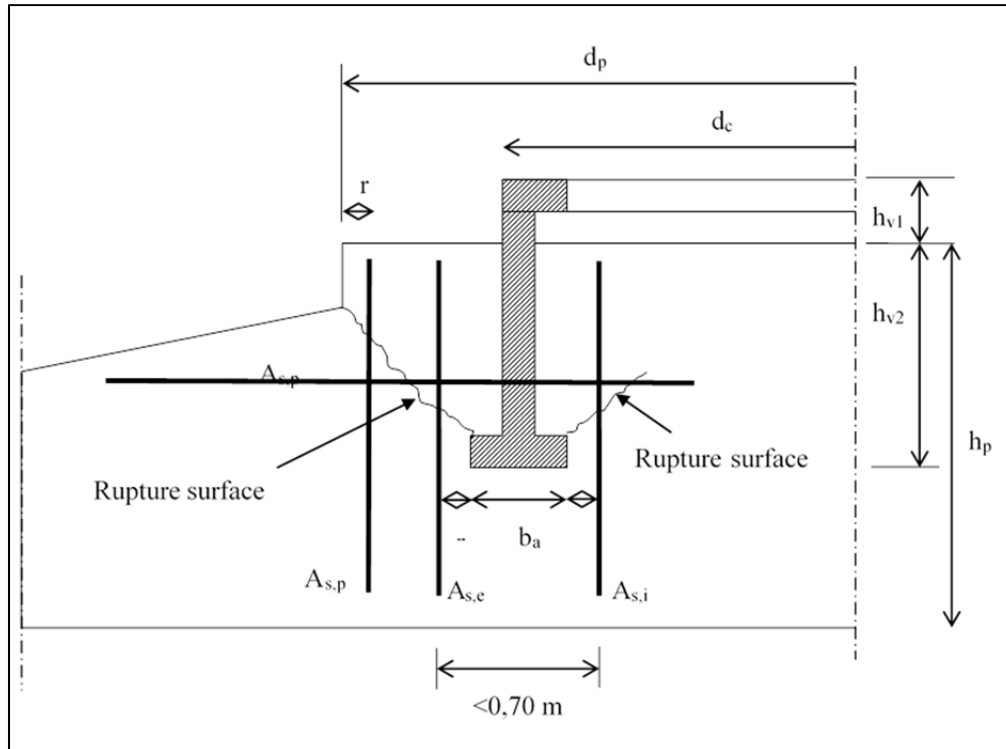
Foundation steel ring embedded in the foundation concrete slab
